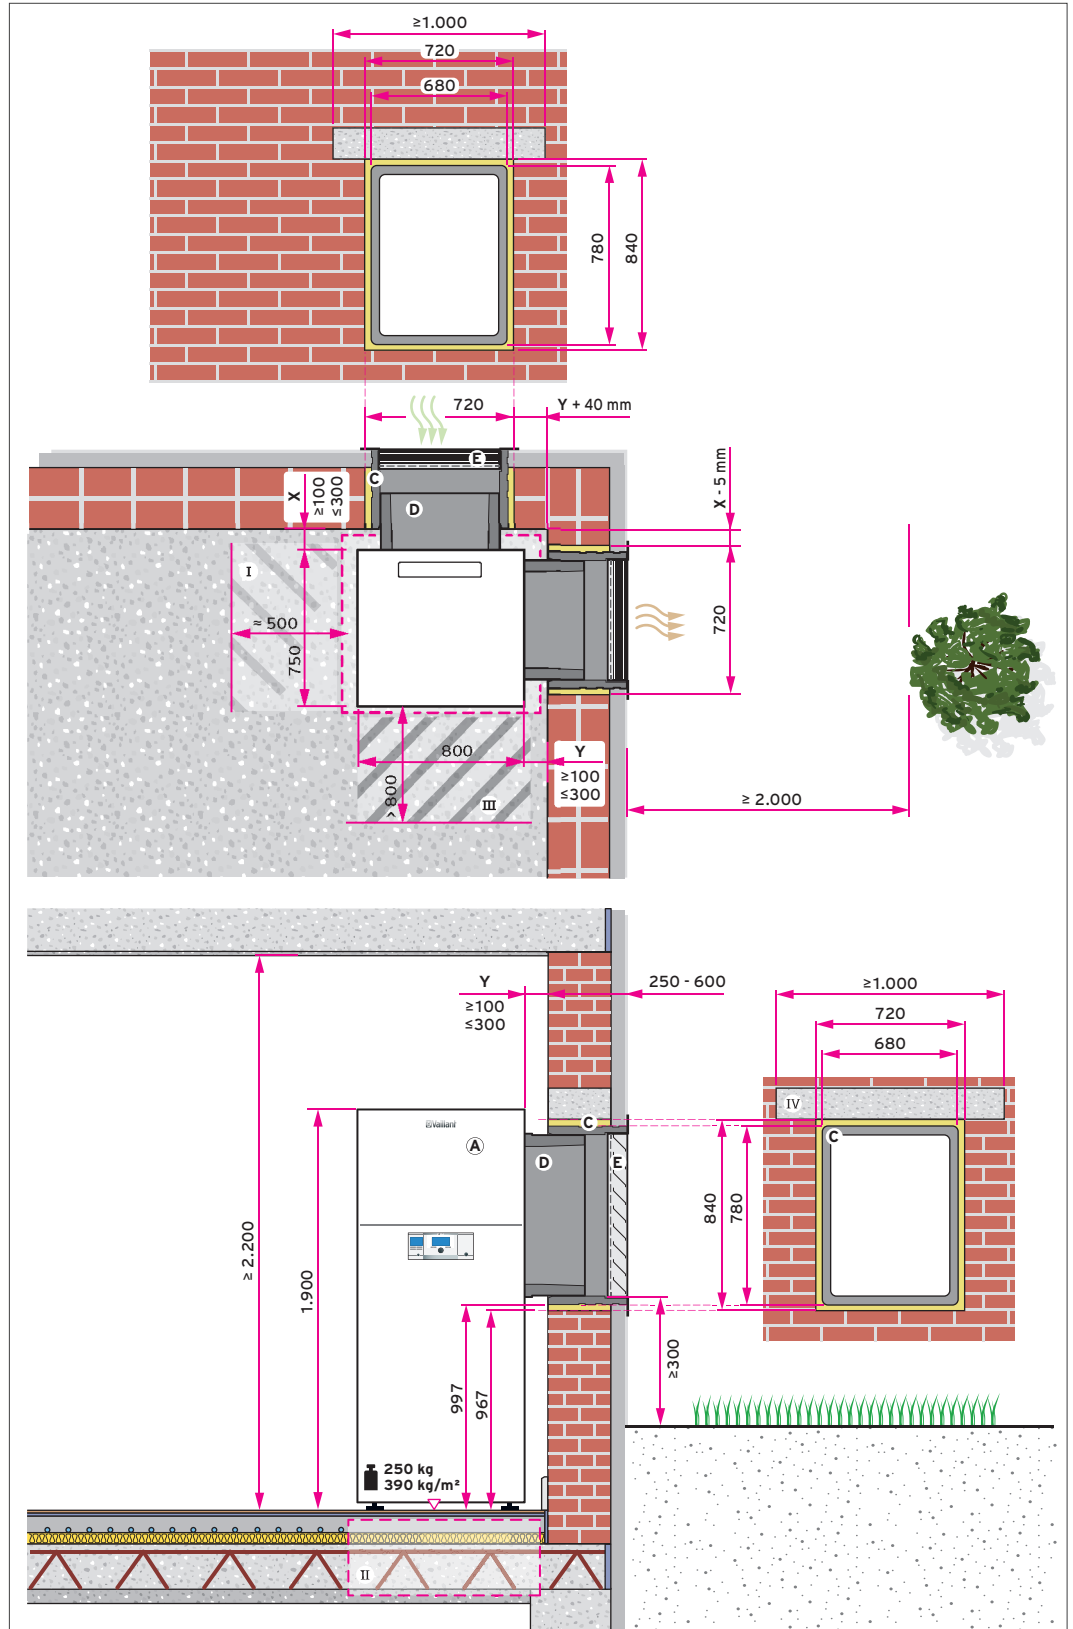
versoTHERM installation situation, ground floor - right-hand installation in the corner of a room
